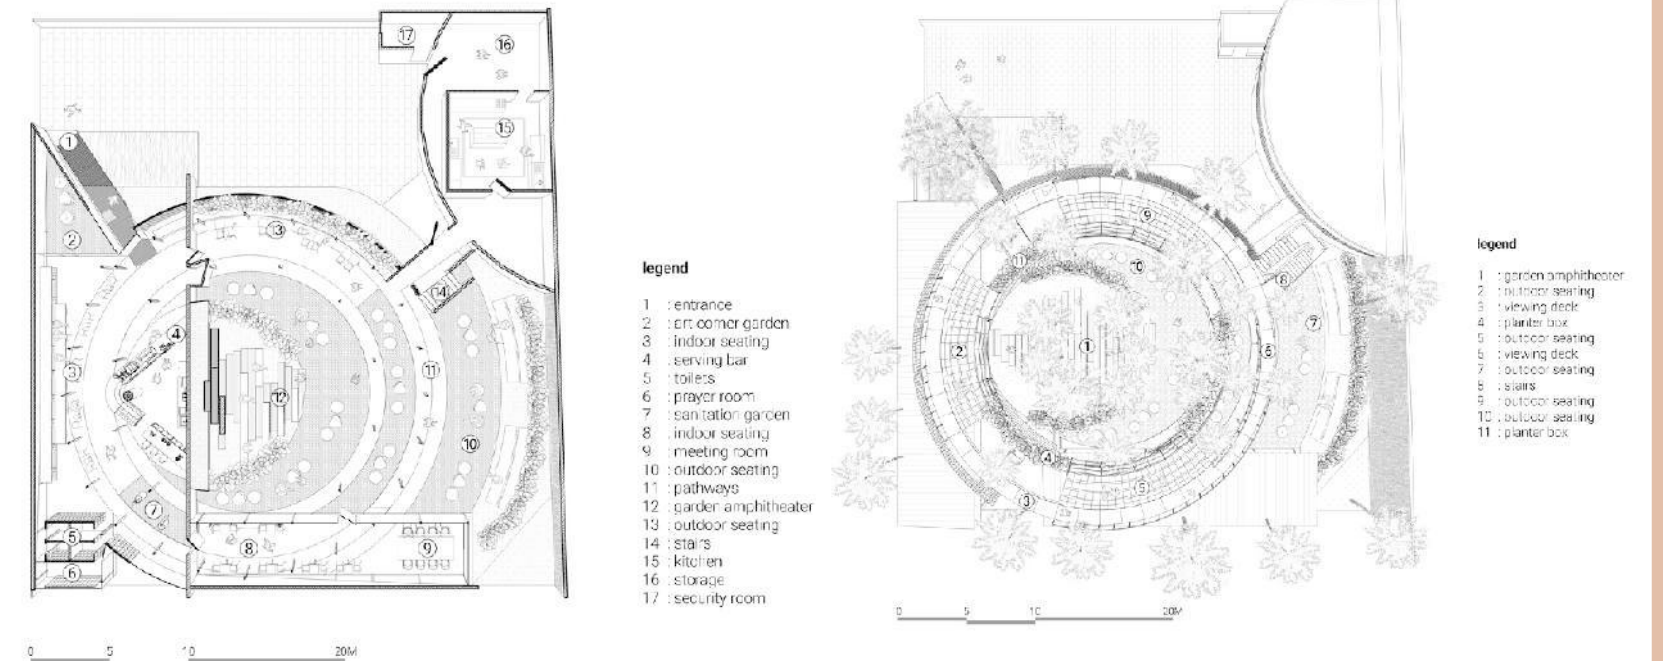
Tanatap Ring Garden Plan. Source : ArchDaily
